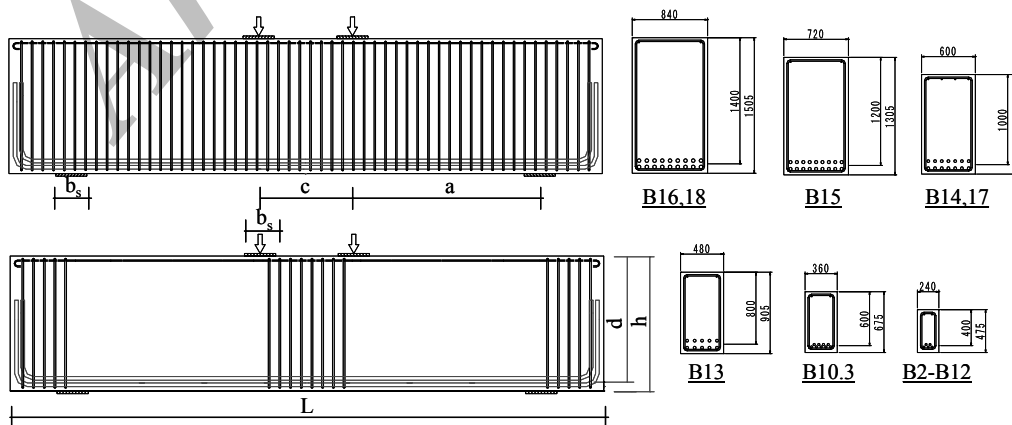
Detail of specimens with and without stirrups (unit: mm)
